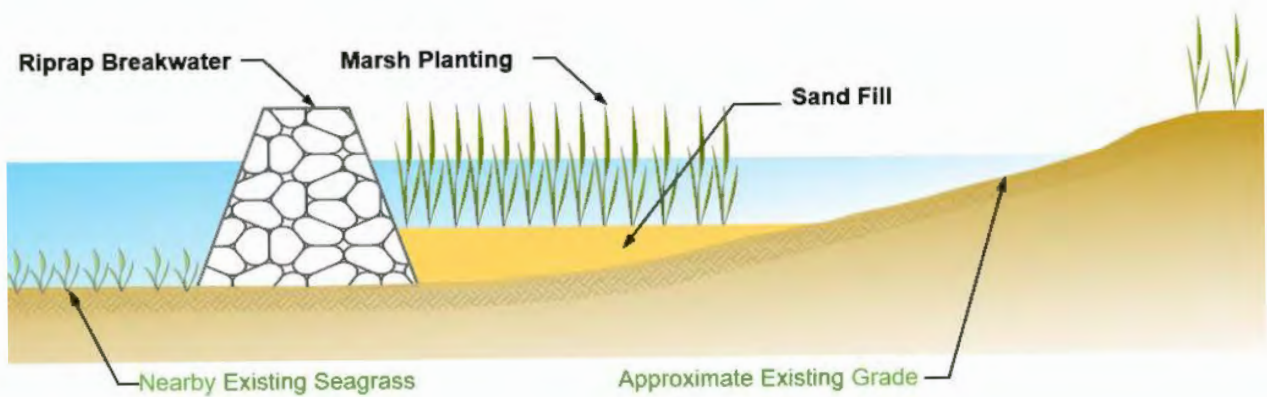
Conceptual section view of Alternative 3: riprap breakwater with marsh fill and planting
